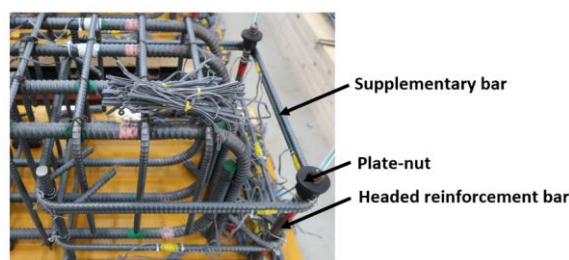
Headed reinforcement and transverse reinforcement bars in concrete member
